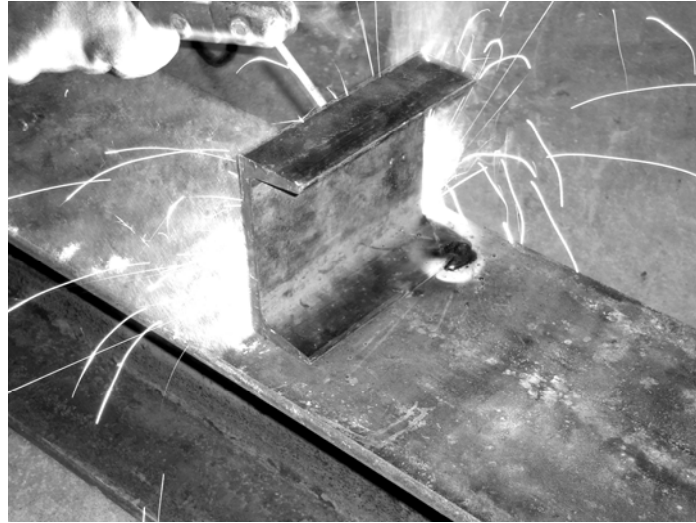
Channel shear connector welded to beam flange.
